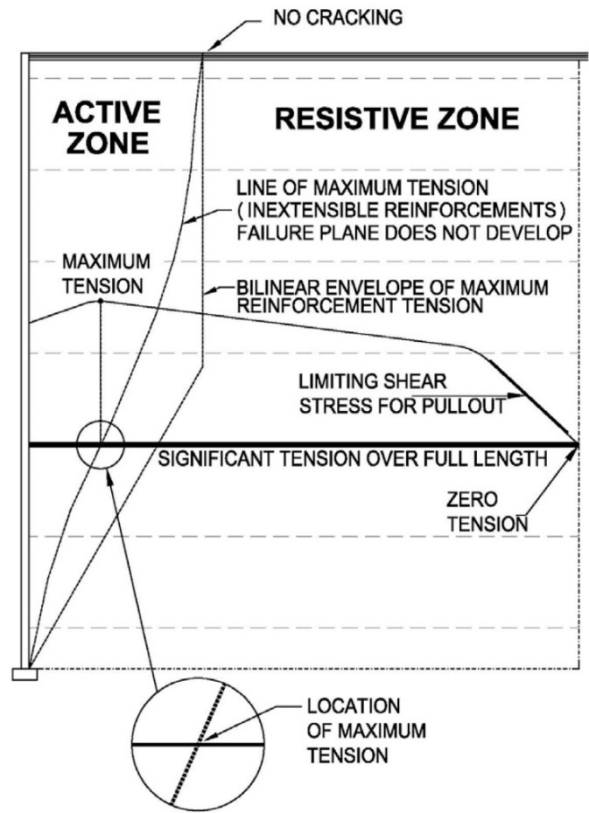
Inextensible reinforcement, bilinear failure plane (Anderson et al., 2010).
